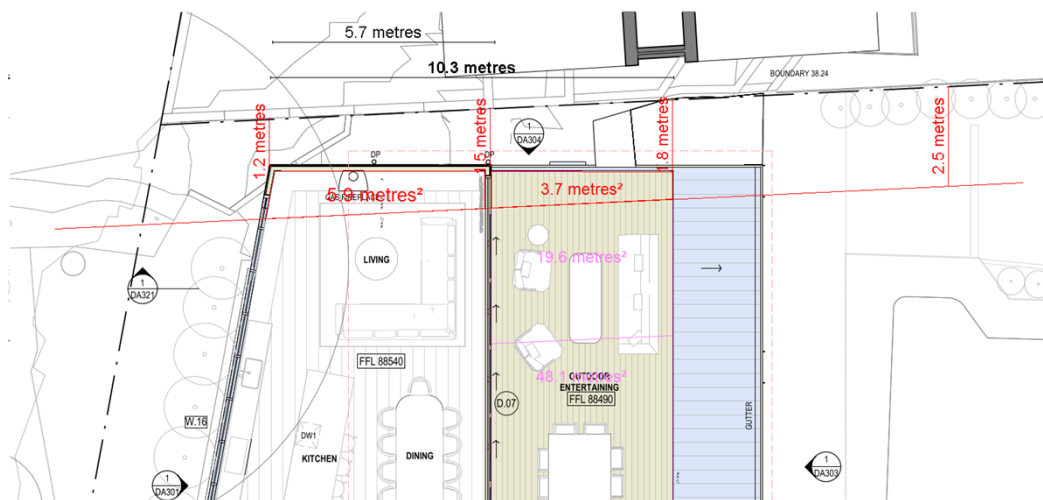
Second Floor Plan – encroachment to the 2.5m side setback is detailed (extract is prior to the reduction of the balcony size).
